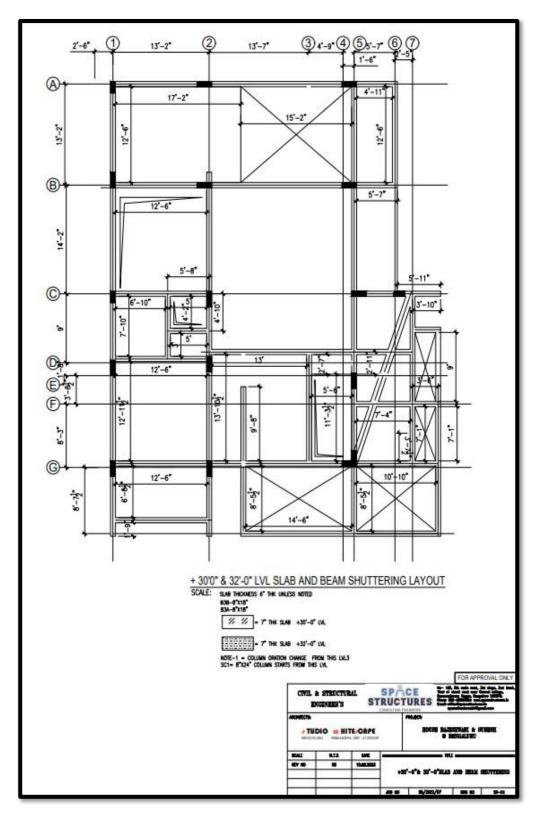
\}$ Provided shuttering layout to the given plan layout
